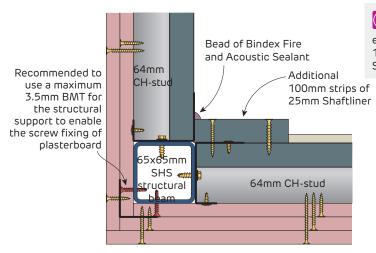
Detail using SHS Beam with 64mm CH-Studs
